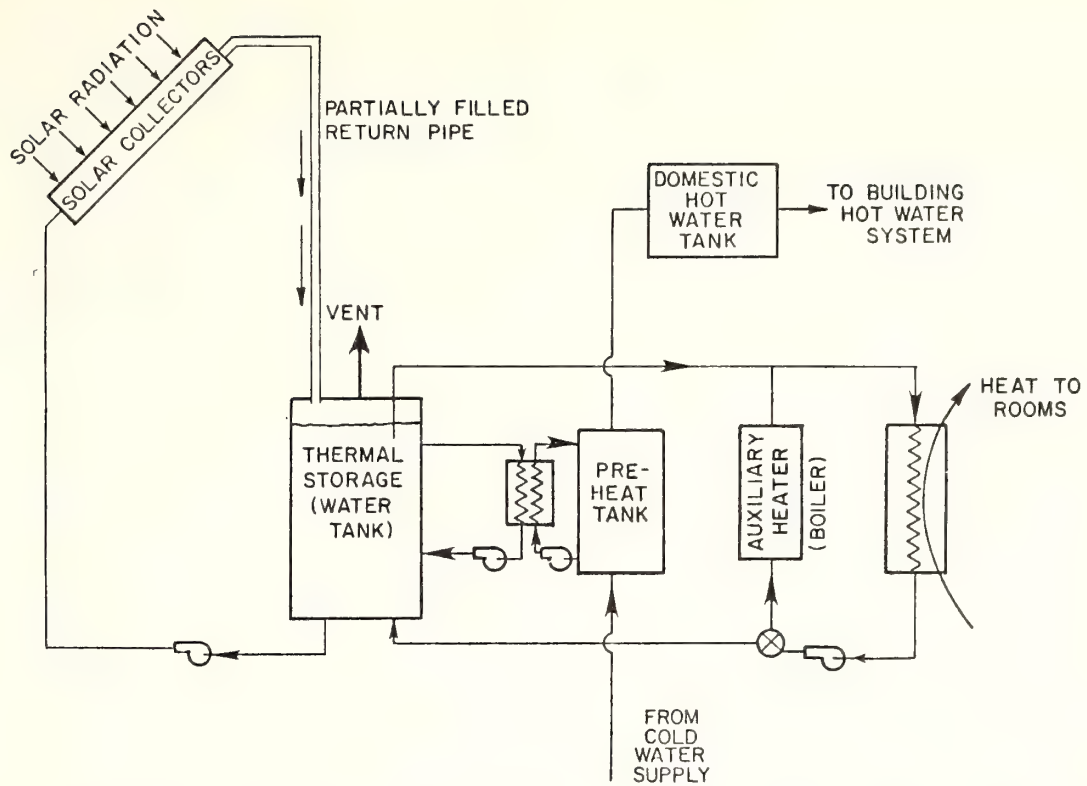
Schematic Diagram of a Single-Liquid (Drain-Back) Space Heating and Water Heating System (Gravity Return)
